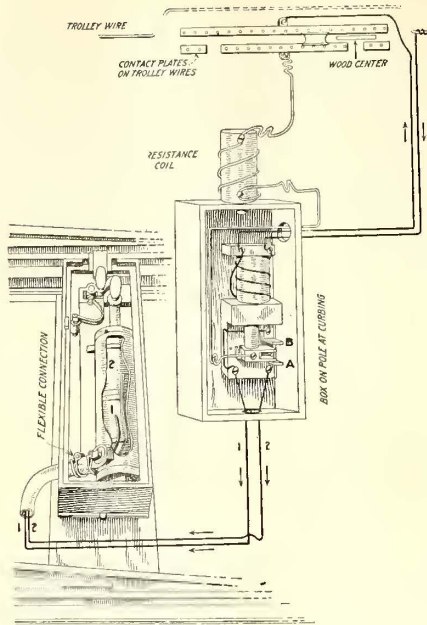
WIRING DIAGRAM OF A COMPLETE MODERN ELECTRIC SWITCH INSTALLATION
